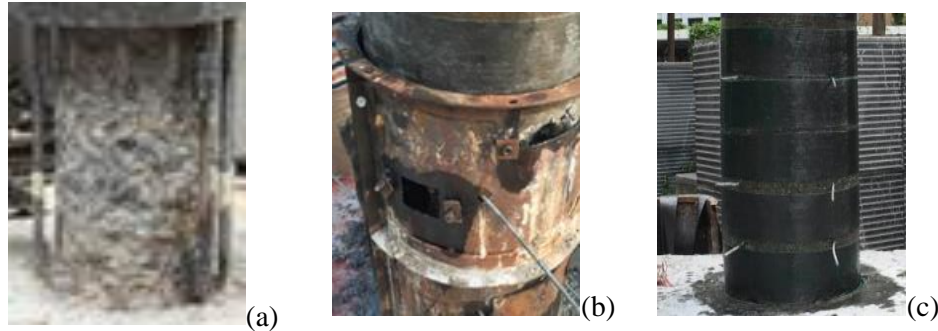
Rapid repair and seismic retrofitting solution for damaged RC pier (Lavorato et al. 2015a,b): a) damaged concrete and rebar parts removal; b) concrete restoration; c) seismic retrofitting by C-FRP wrapping.
